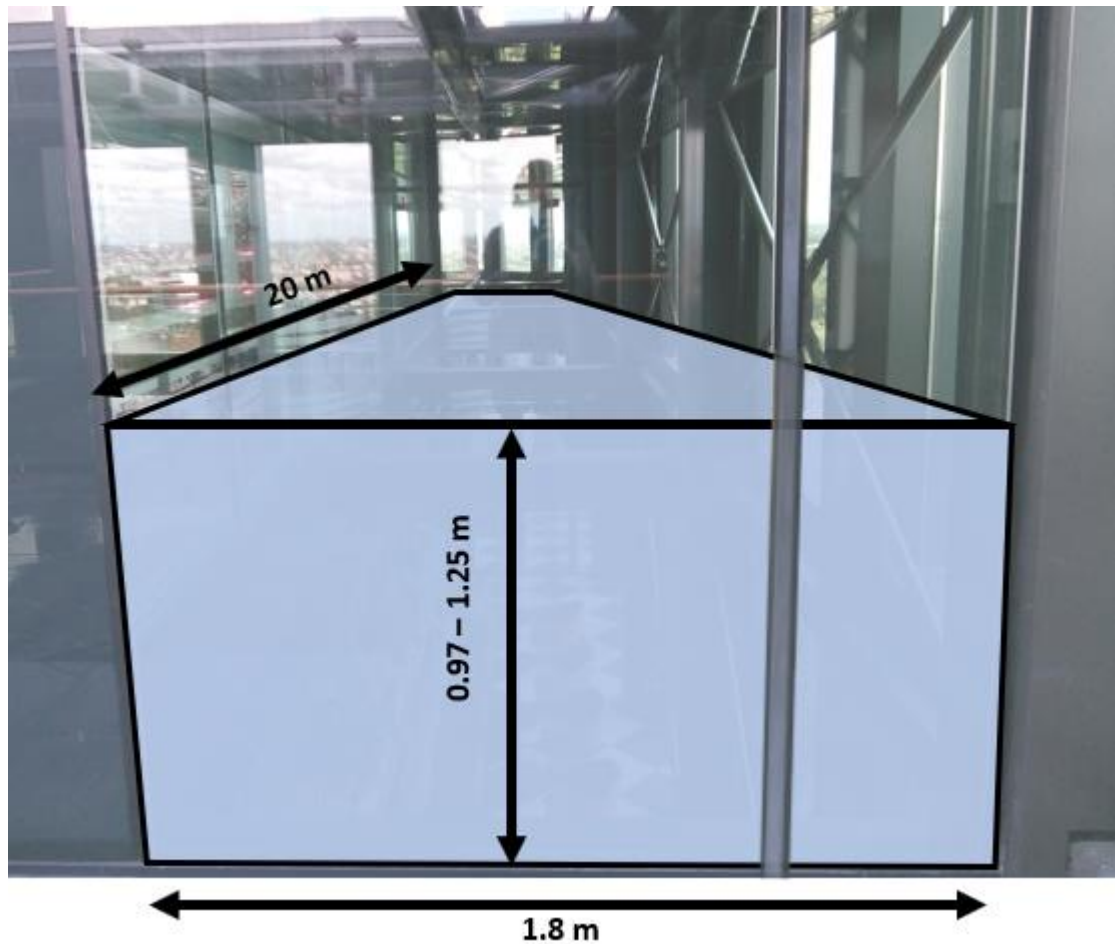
Suggested water storage solution, on top of building, right next to the greenhouse (on the left)
